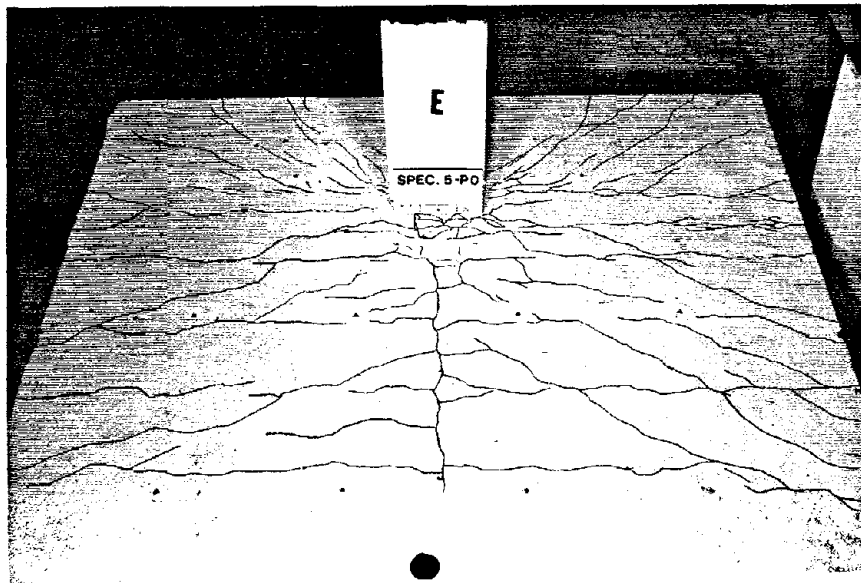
Specimen 5SO - Exterior connection crack pattern after test
